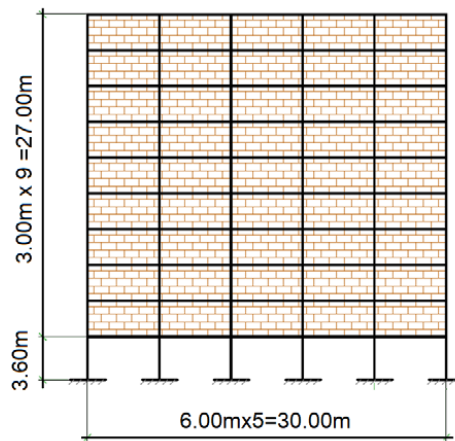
Scheme of the transverse frame of the reinforced concrete building structure
